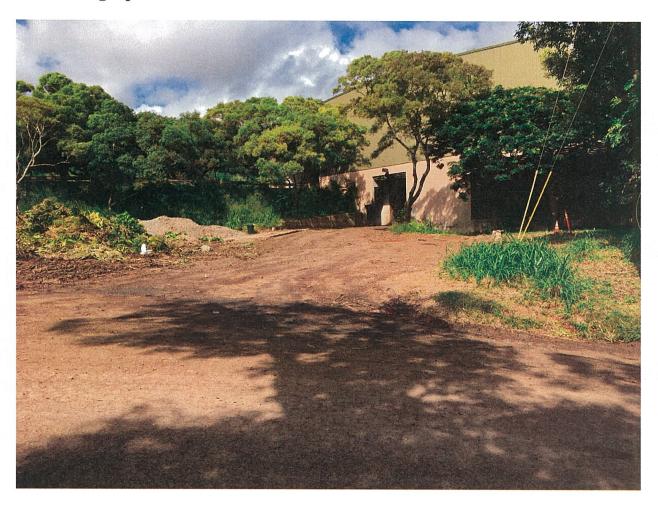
Location of proposed green waste loading bay, new concrete pad, and ashapt pavement; existing Refuse Transfer Building; exising green waste stockpiling area; existing Forsoma koa and monkeypod trees to be removed.
